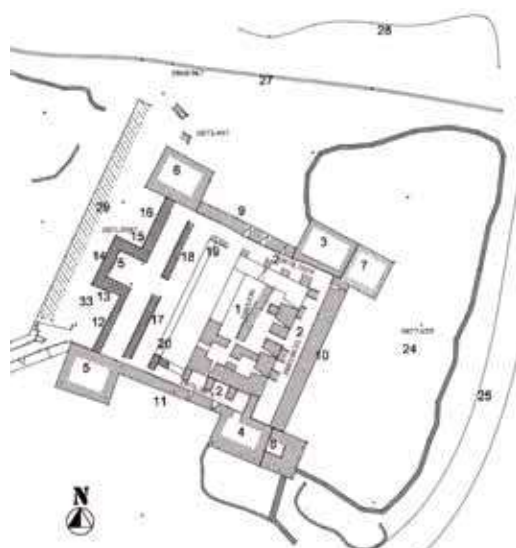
Blown up Layout plan of the Chubjakha Dzong ruin
